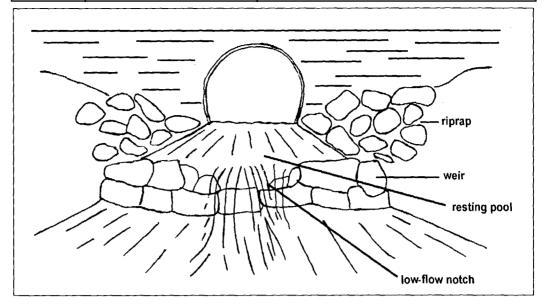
Resting pool concept at a culvert outlet. Note low-flow notch and the use of riprap for bank protection.
